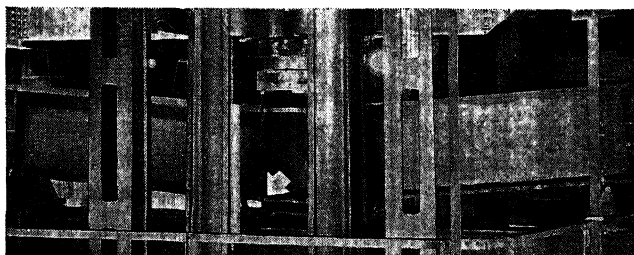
Under 622,100 lb. load. Arrow points to connection which failed at this loading.
